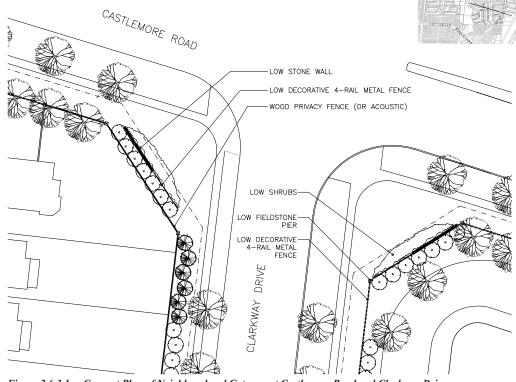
Concept Plan of Neighbourhood Gateway at Castlemore Road and Clarkway Drive
